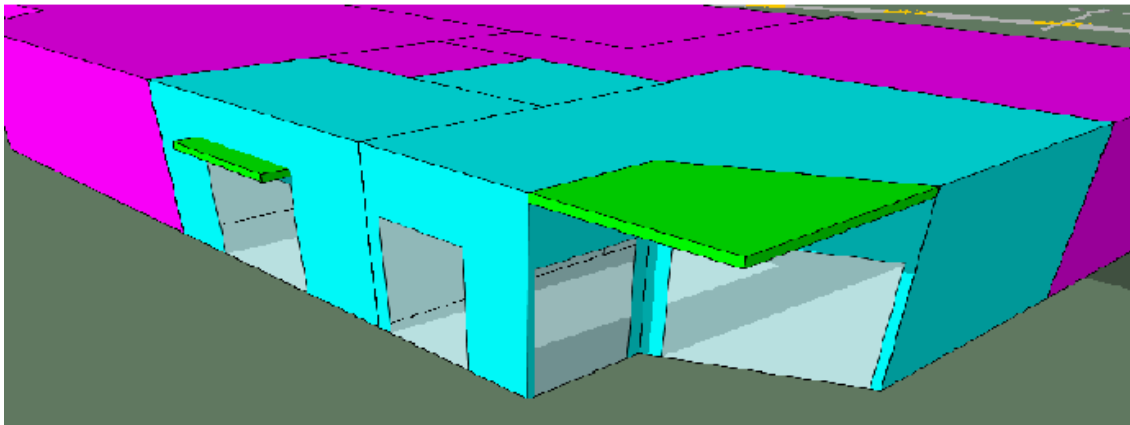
Block JKL 5th Floor Shading. 400mm deep shade required for bedroom, and shade to cover balcony on living/kitchen room corner
